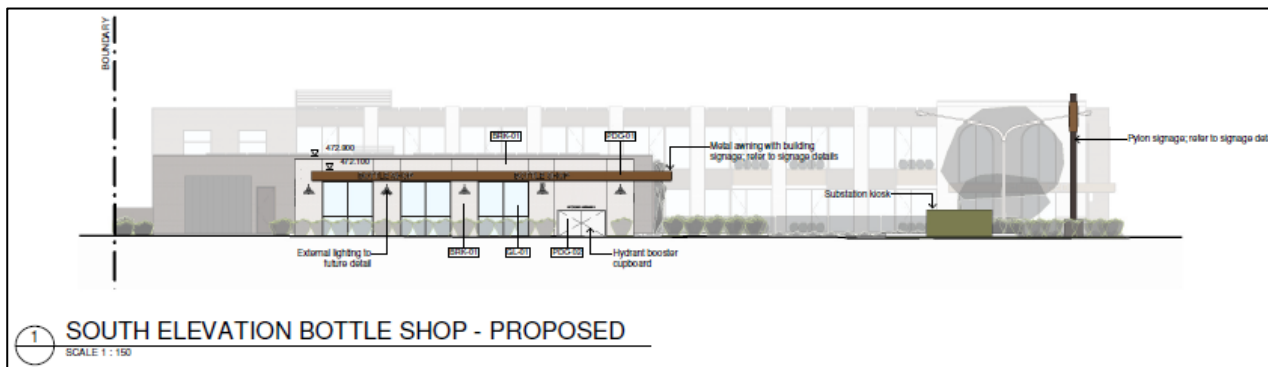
Elevation Plan – Bottleshop with new two storey hotel to the rear of the site (Inglis Street Elevation)
